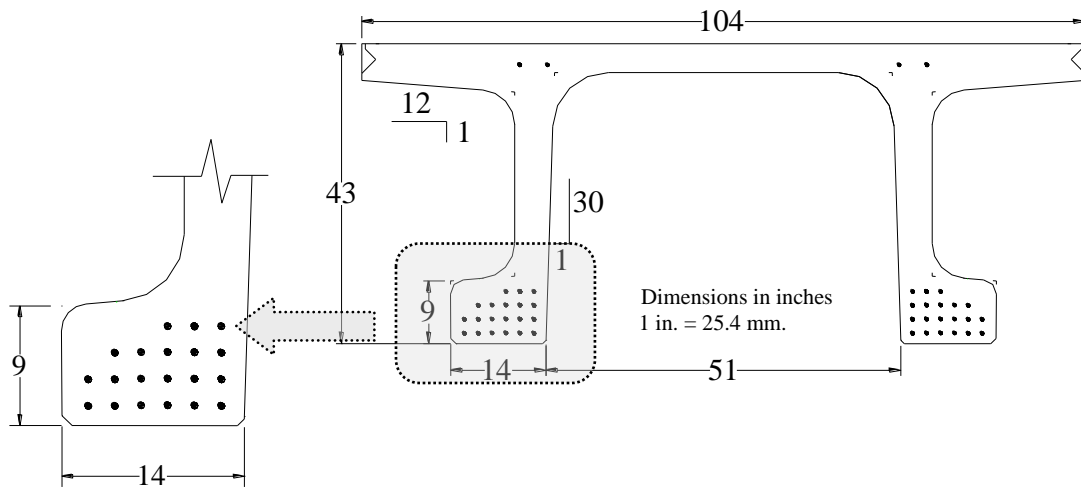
Strand layout of 43-inch-deep section for 105-foot (32.0m) span
